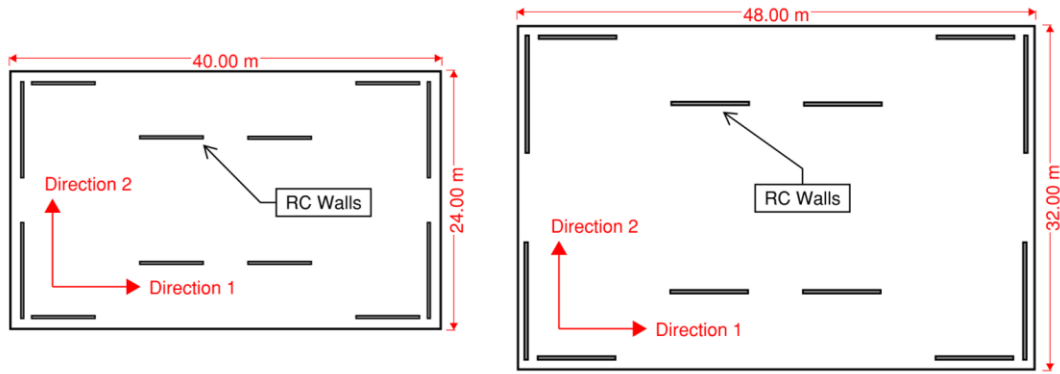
Plan view of case study RC wall buildings (left: 4-storey, right: 12-storey) (number of walls varies according to the design).
